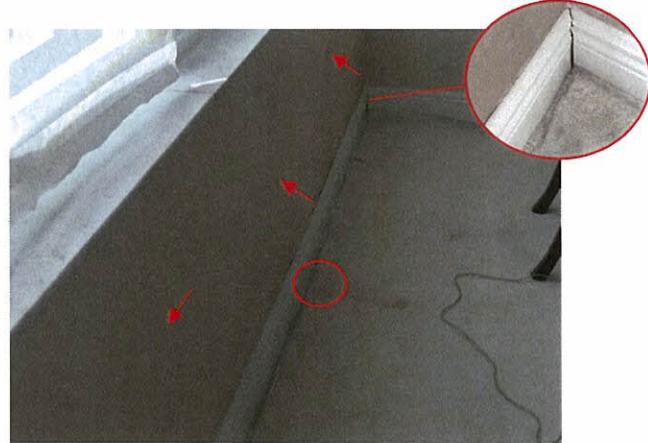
Evidence of water intrusion at wall below window sill from openings created by the wind buffeting due to Hurricane Irma's wind pressures exerted on the building envelope.
